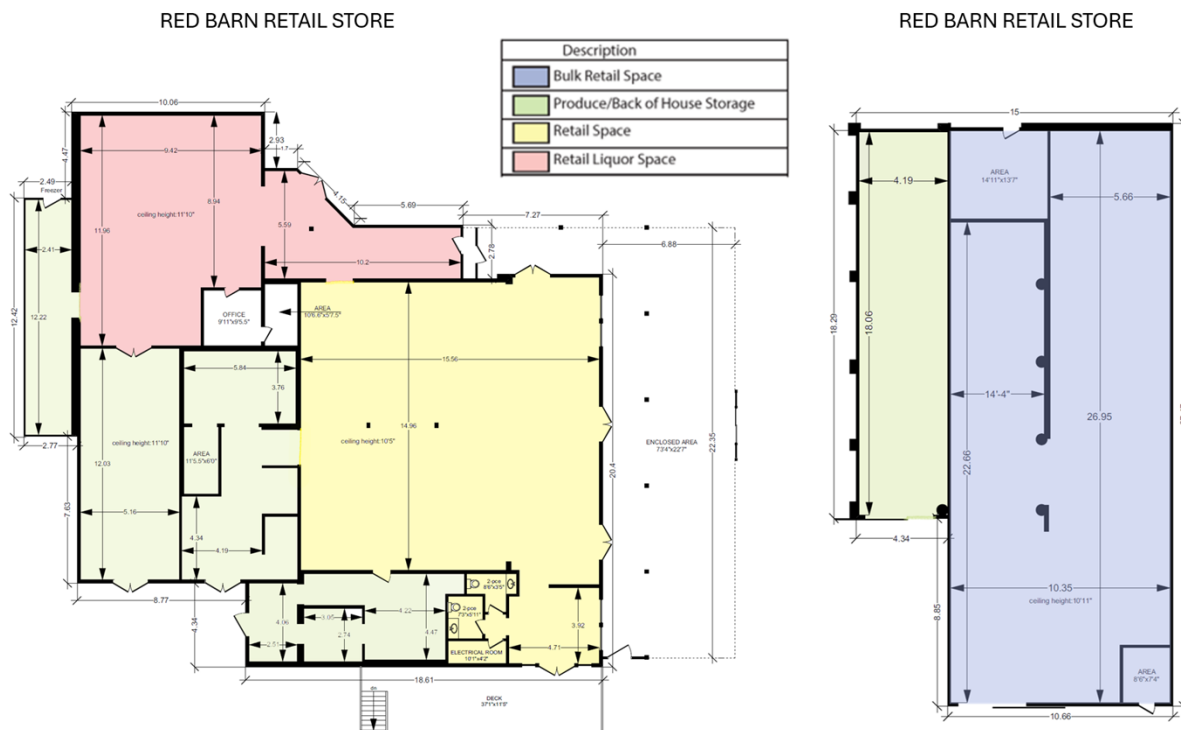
Proposed Uses (applicant Plans, annotated by staff)
